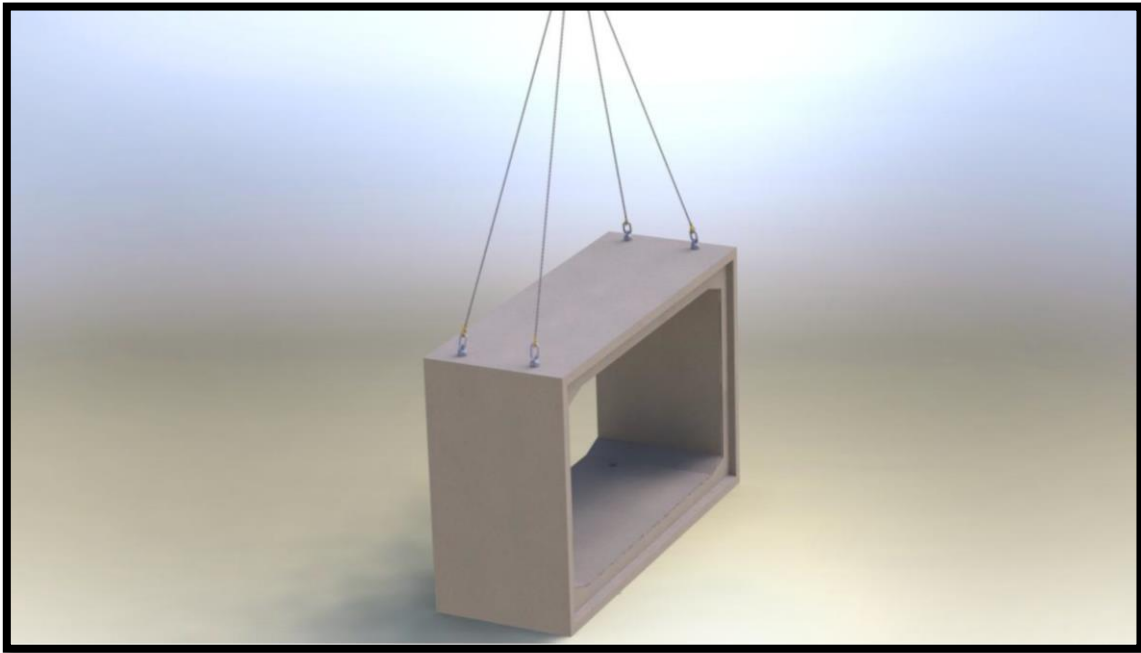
Sockets in the top slab to be used for laying standard Box Culverts
